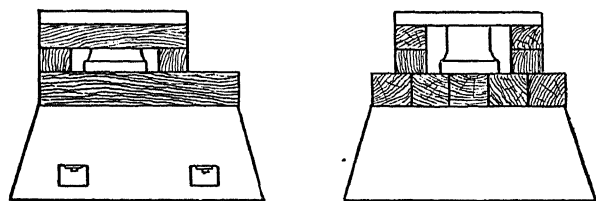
Concrete and Timber Foundation for Steam Hammer.
